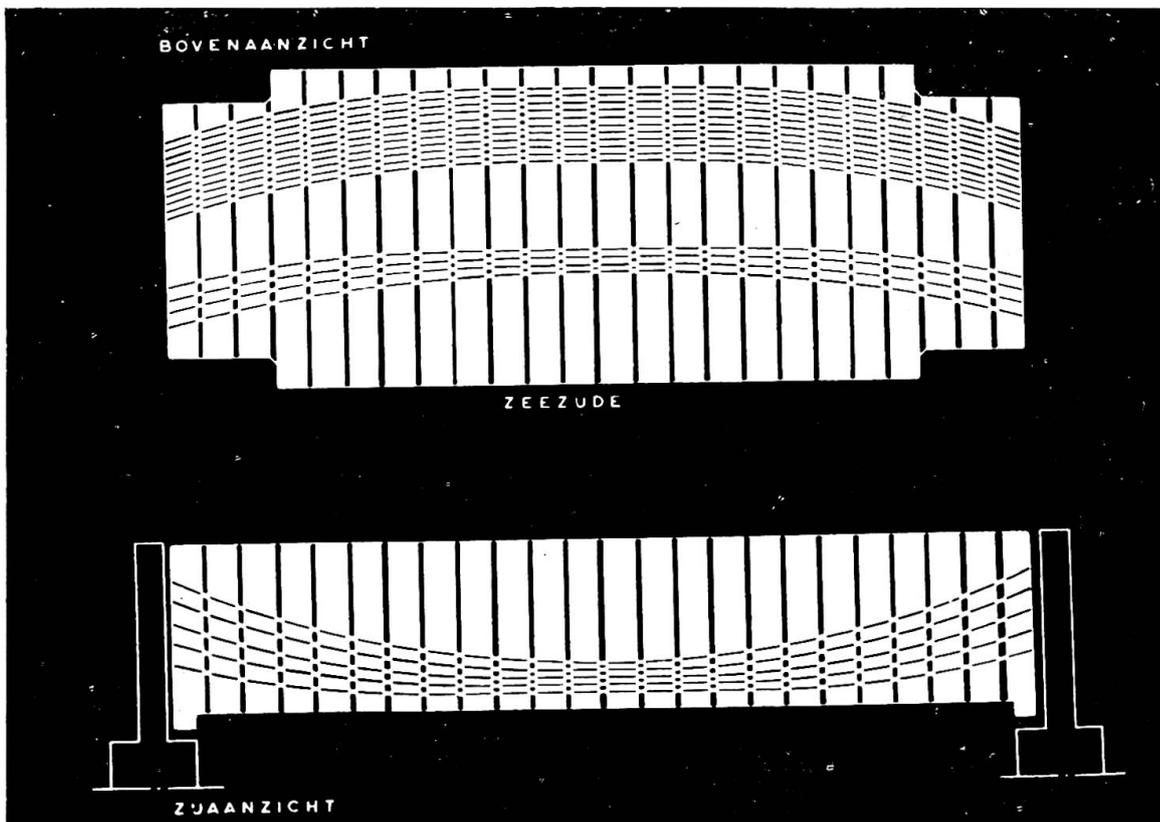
The prestressing cables in longitudinal direction. Bovenaanzicht = upper view. Zijaanzicht = side view. Zeezijde = seaside.
